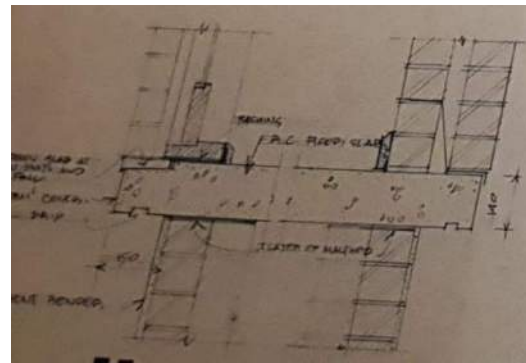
Existing architectural drawing showing detail of suspended ground slab structure and masonry wall interface.
